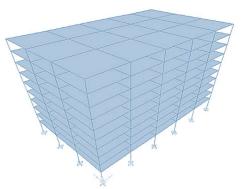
A Typical Isometric view of Frames structure without shear wall
